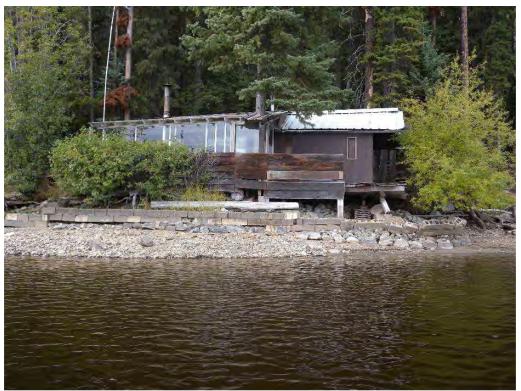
Example of a lease lot retaining wall likely constructed to prevent erosion.
